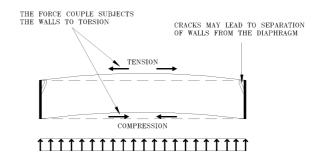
A plan showing how the so-called bow action subjects the end walls to torsion
